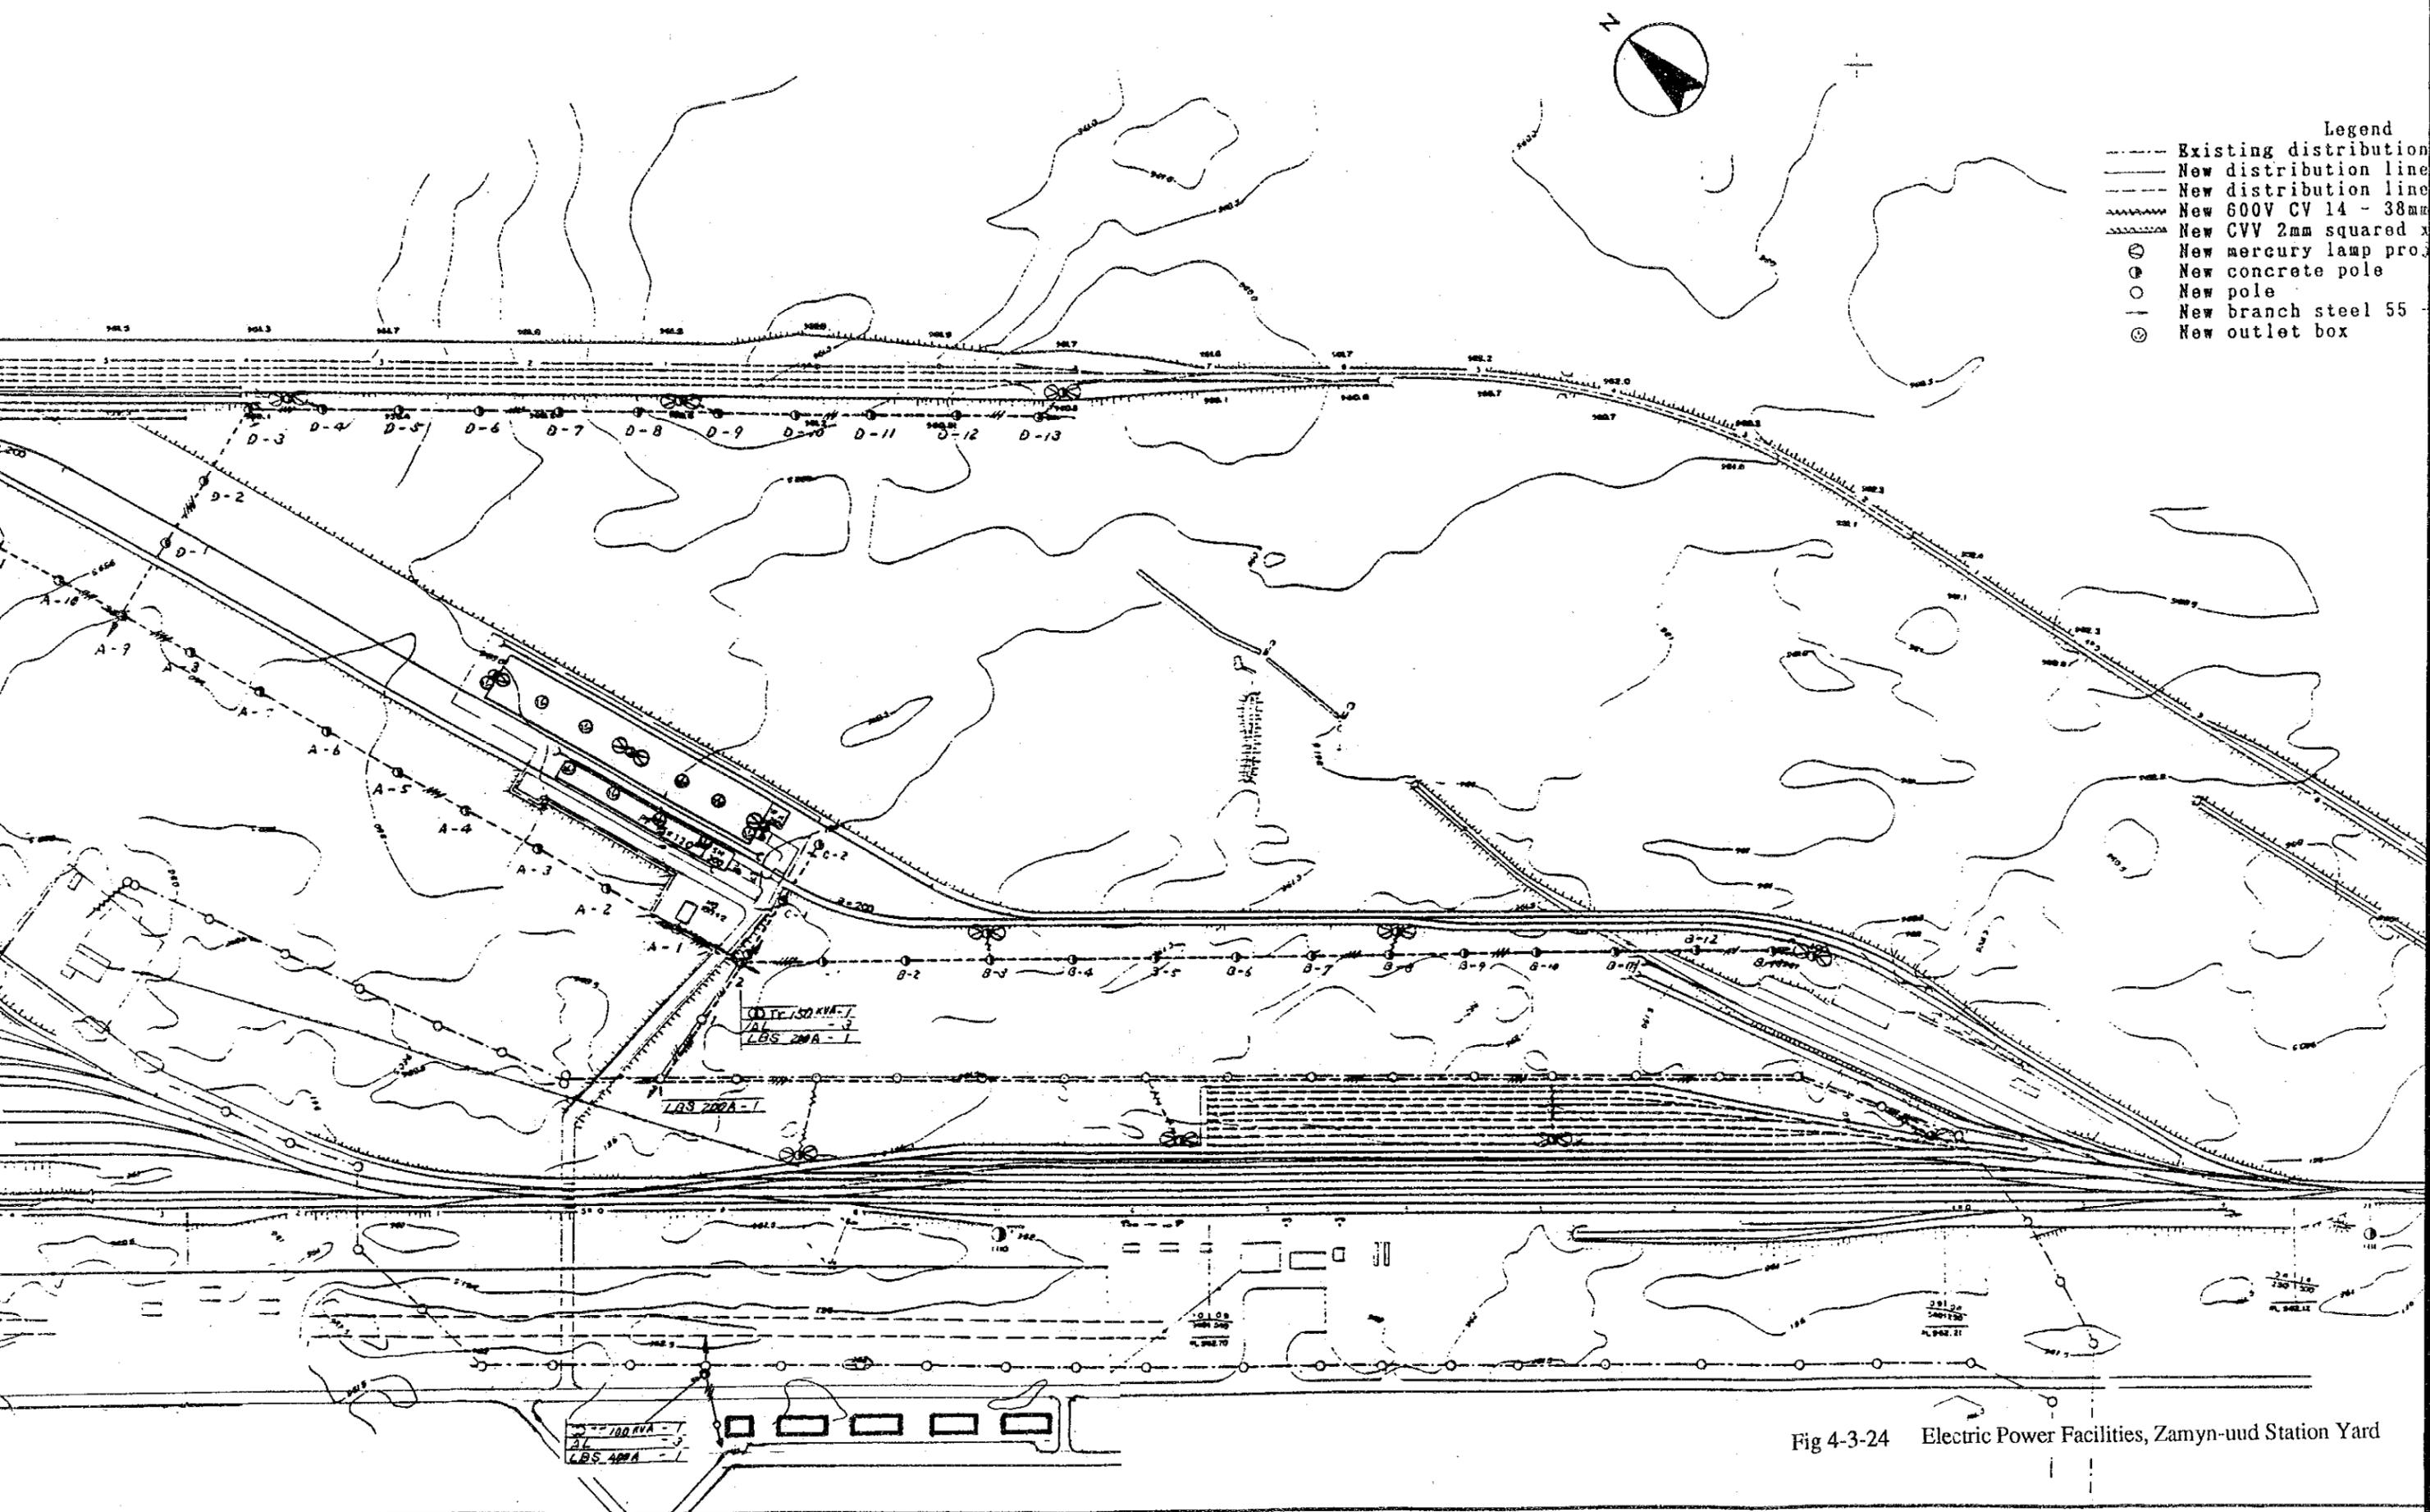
Electric Power Facilities, Zamyn-uid Station Yard
